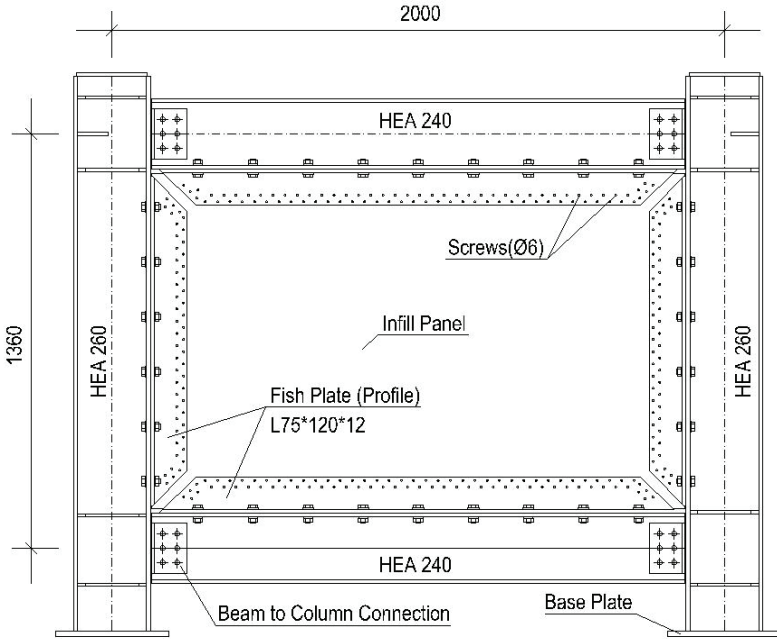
Details of specimen SP1, SP2, CLA and TL (all dimensions are in mm)
